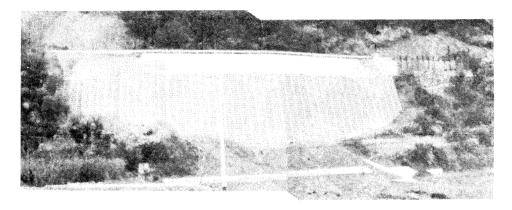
PLANE VIEW OF HIGH EMBANKMENT, RETAINED BY CONCRETE FRAME,
